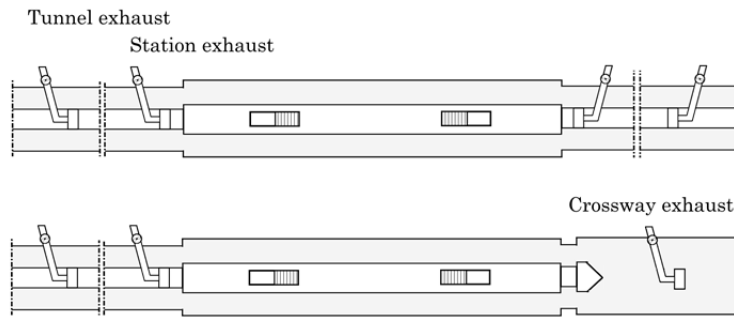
Possible exhaust points locations in a longitudinal approach of station ventilation connected to a tunnel (top) and a crossway (bottom)
